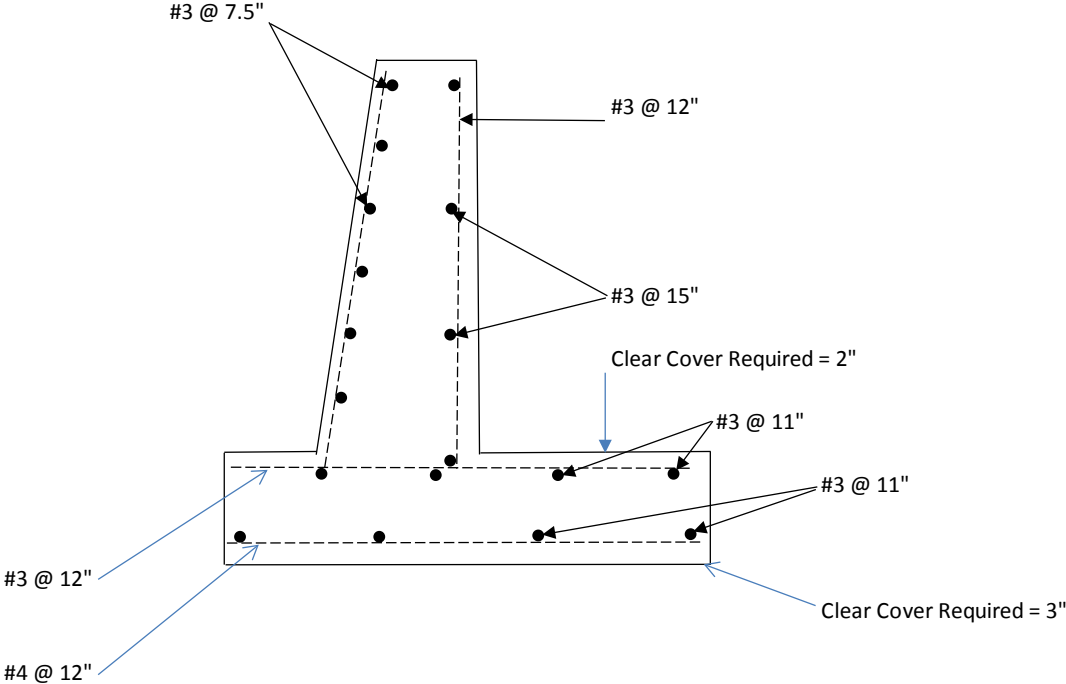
Placement of Reinforcement in Loading Dock Retaining Wall
